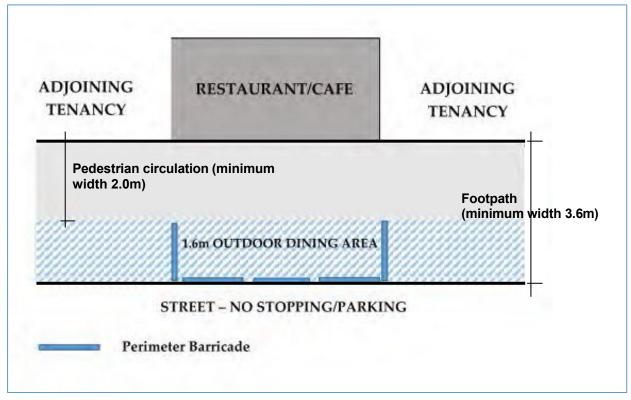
Minimum dimensions for outdoor dining on primary retail streets not adjoining car parking.
